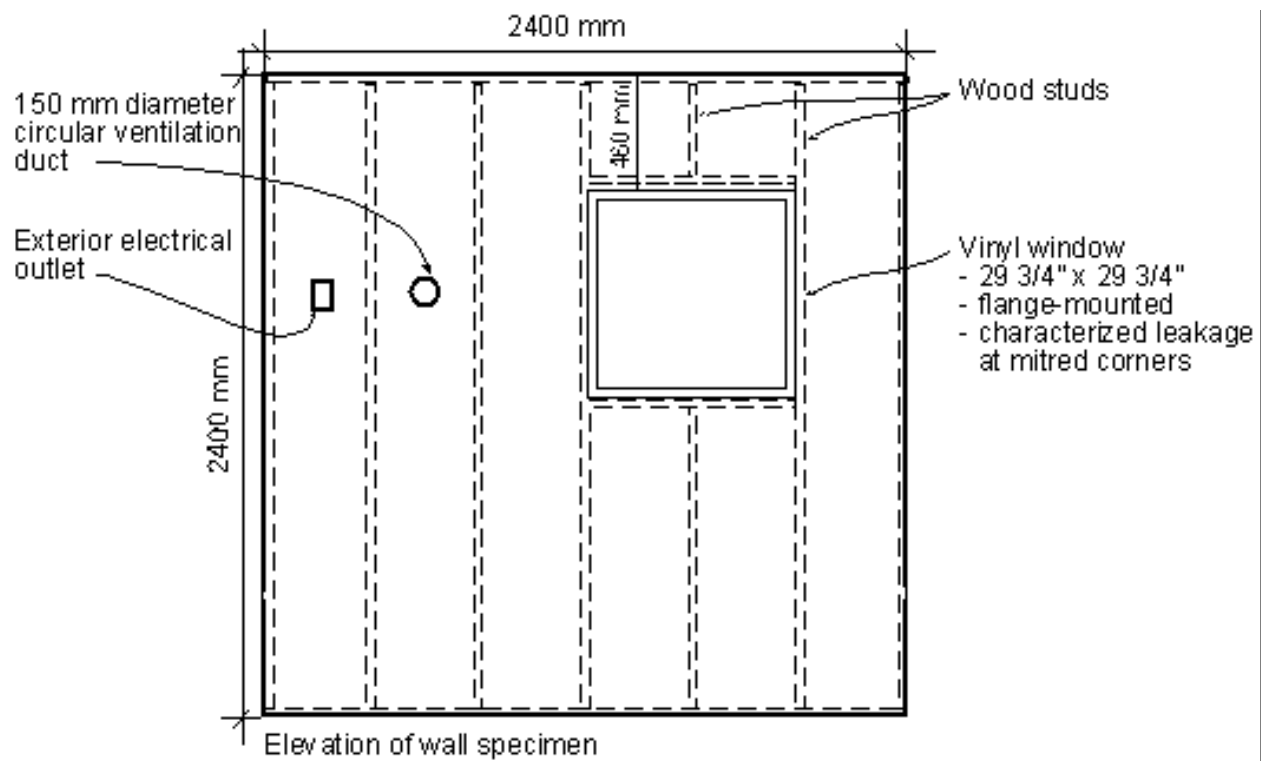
Suggested positioning of penetrations in a typical wall specimen
